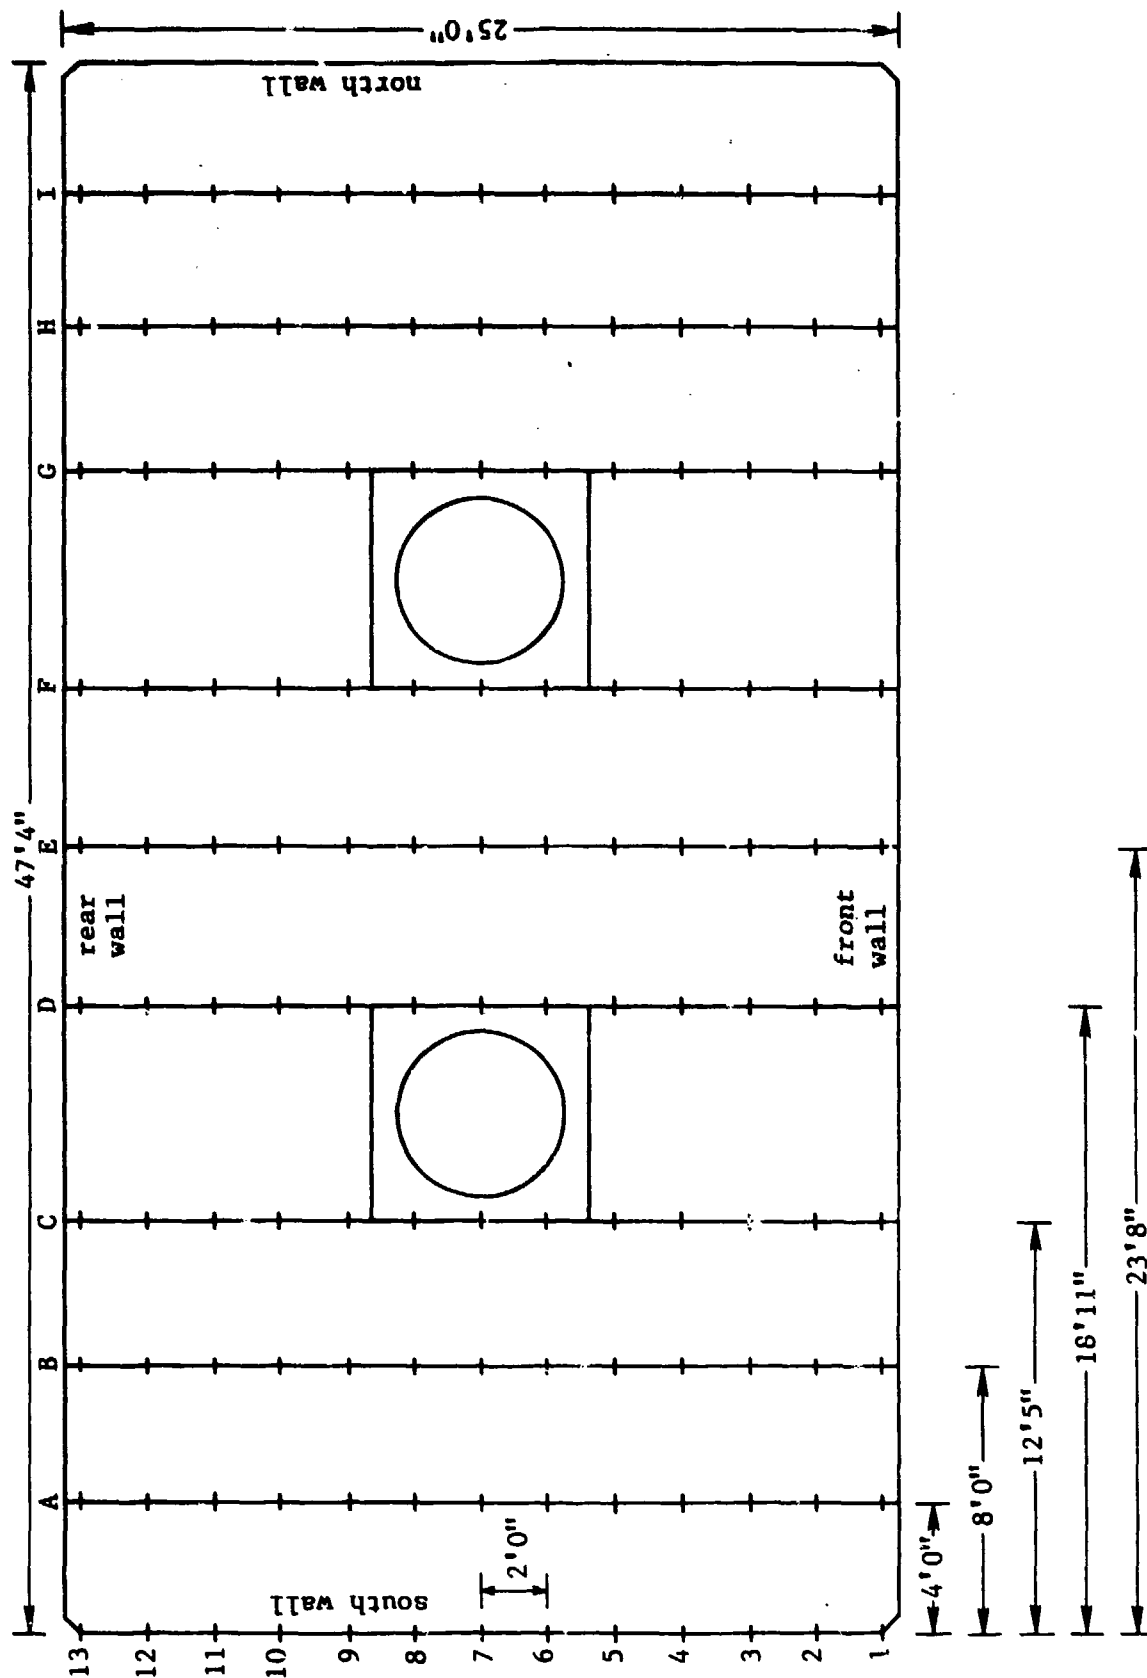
Deflection measurement locations and roof slab profiles for the Type A structure.
